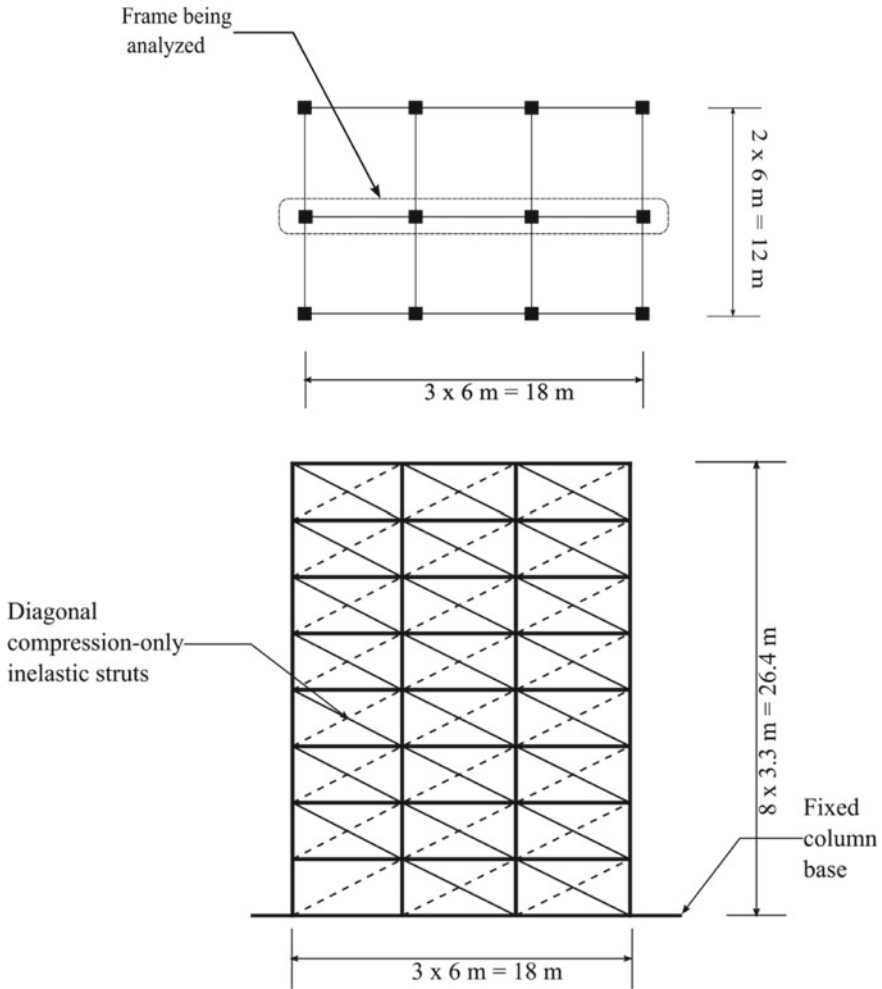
Plan of the building and elevation of the frame being analyzed
